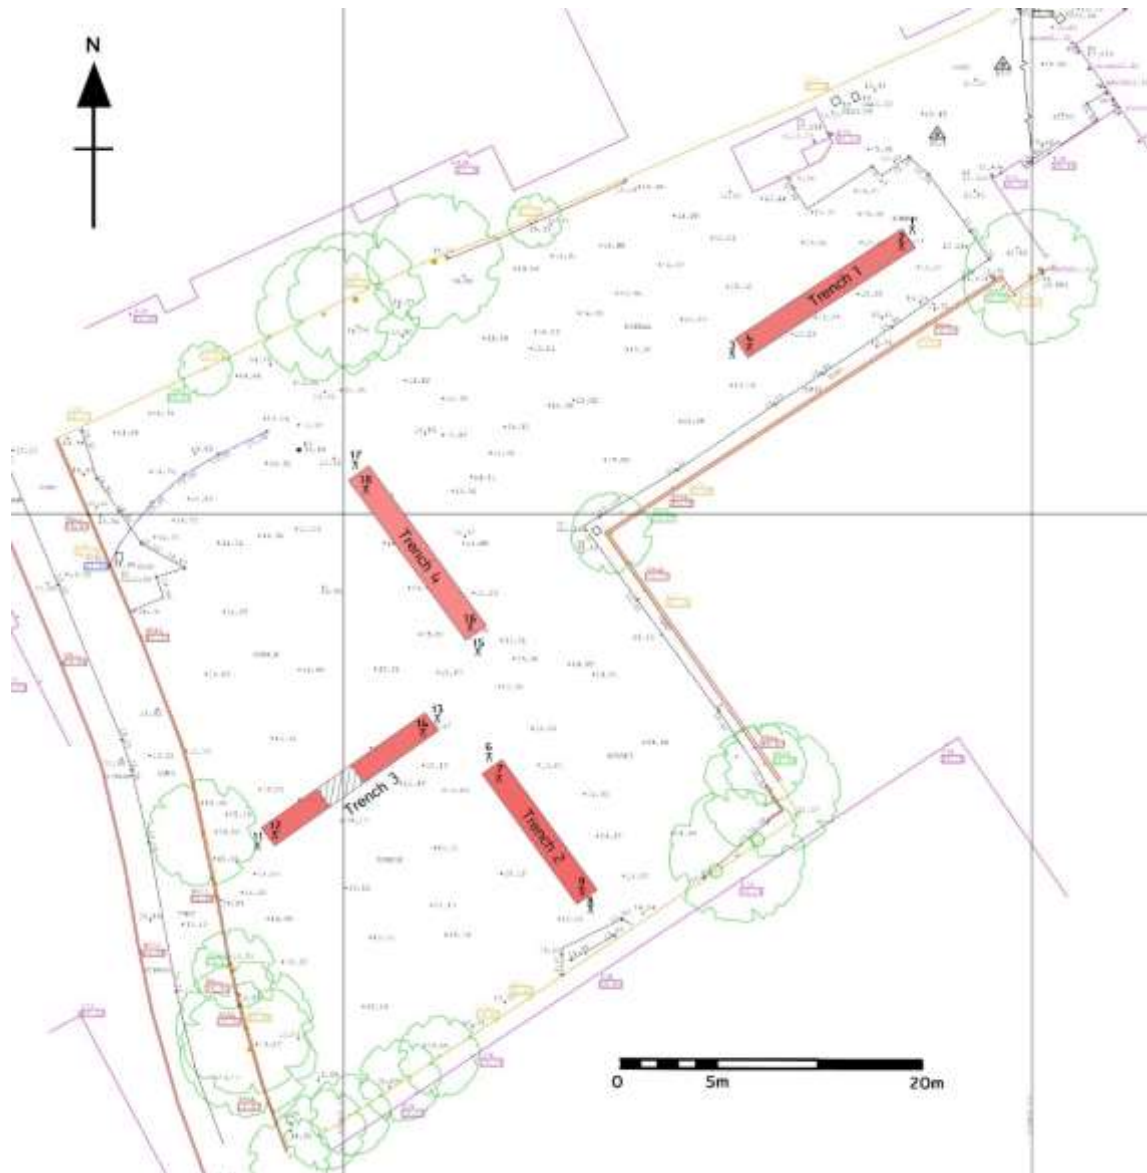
Trench locations added to site survey plan, with levels (see Table 2); Drawing no. SJG2842 (Dovetail Architects, 17.08.19)
